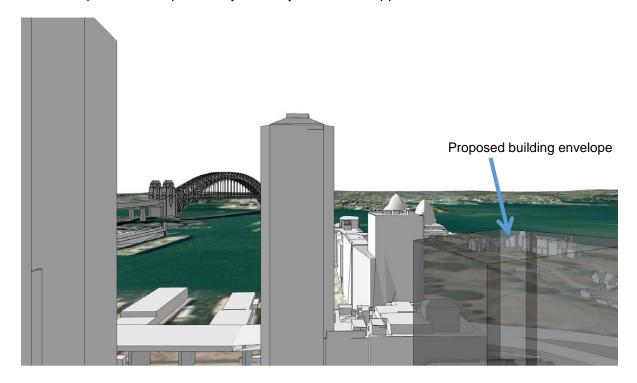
Proposed building envelope as viewed facing north from a typical mid-rise guest room within The InterContinental hotel
